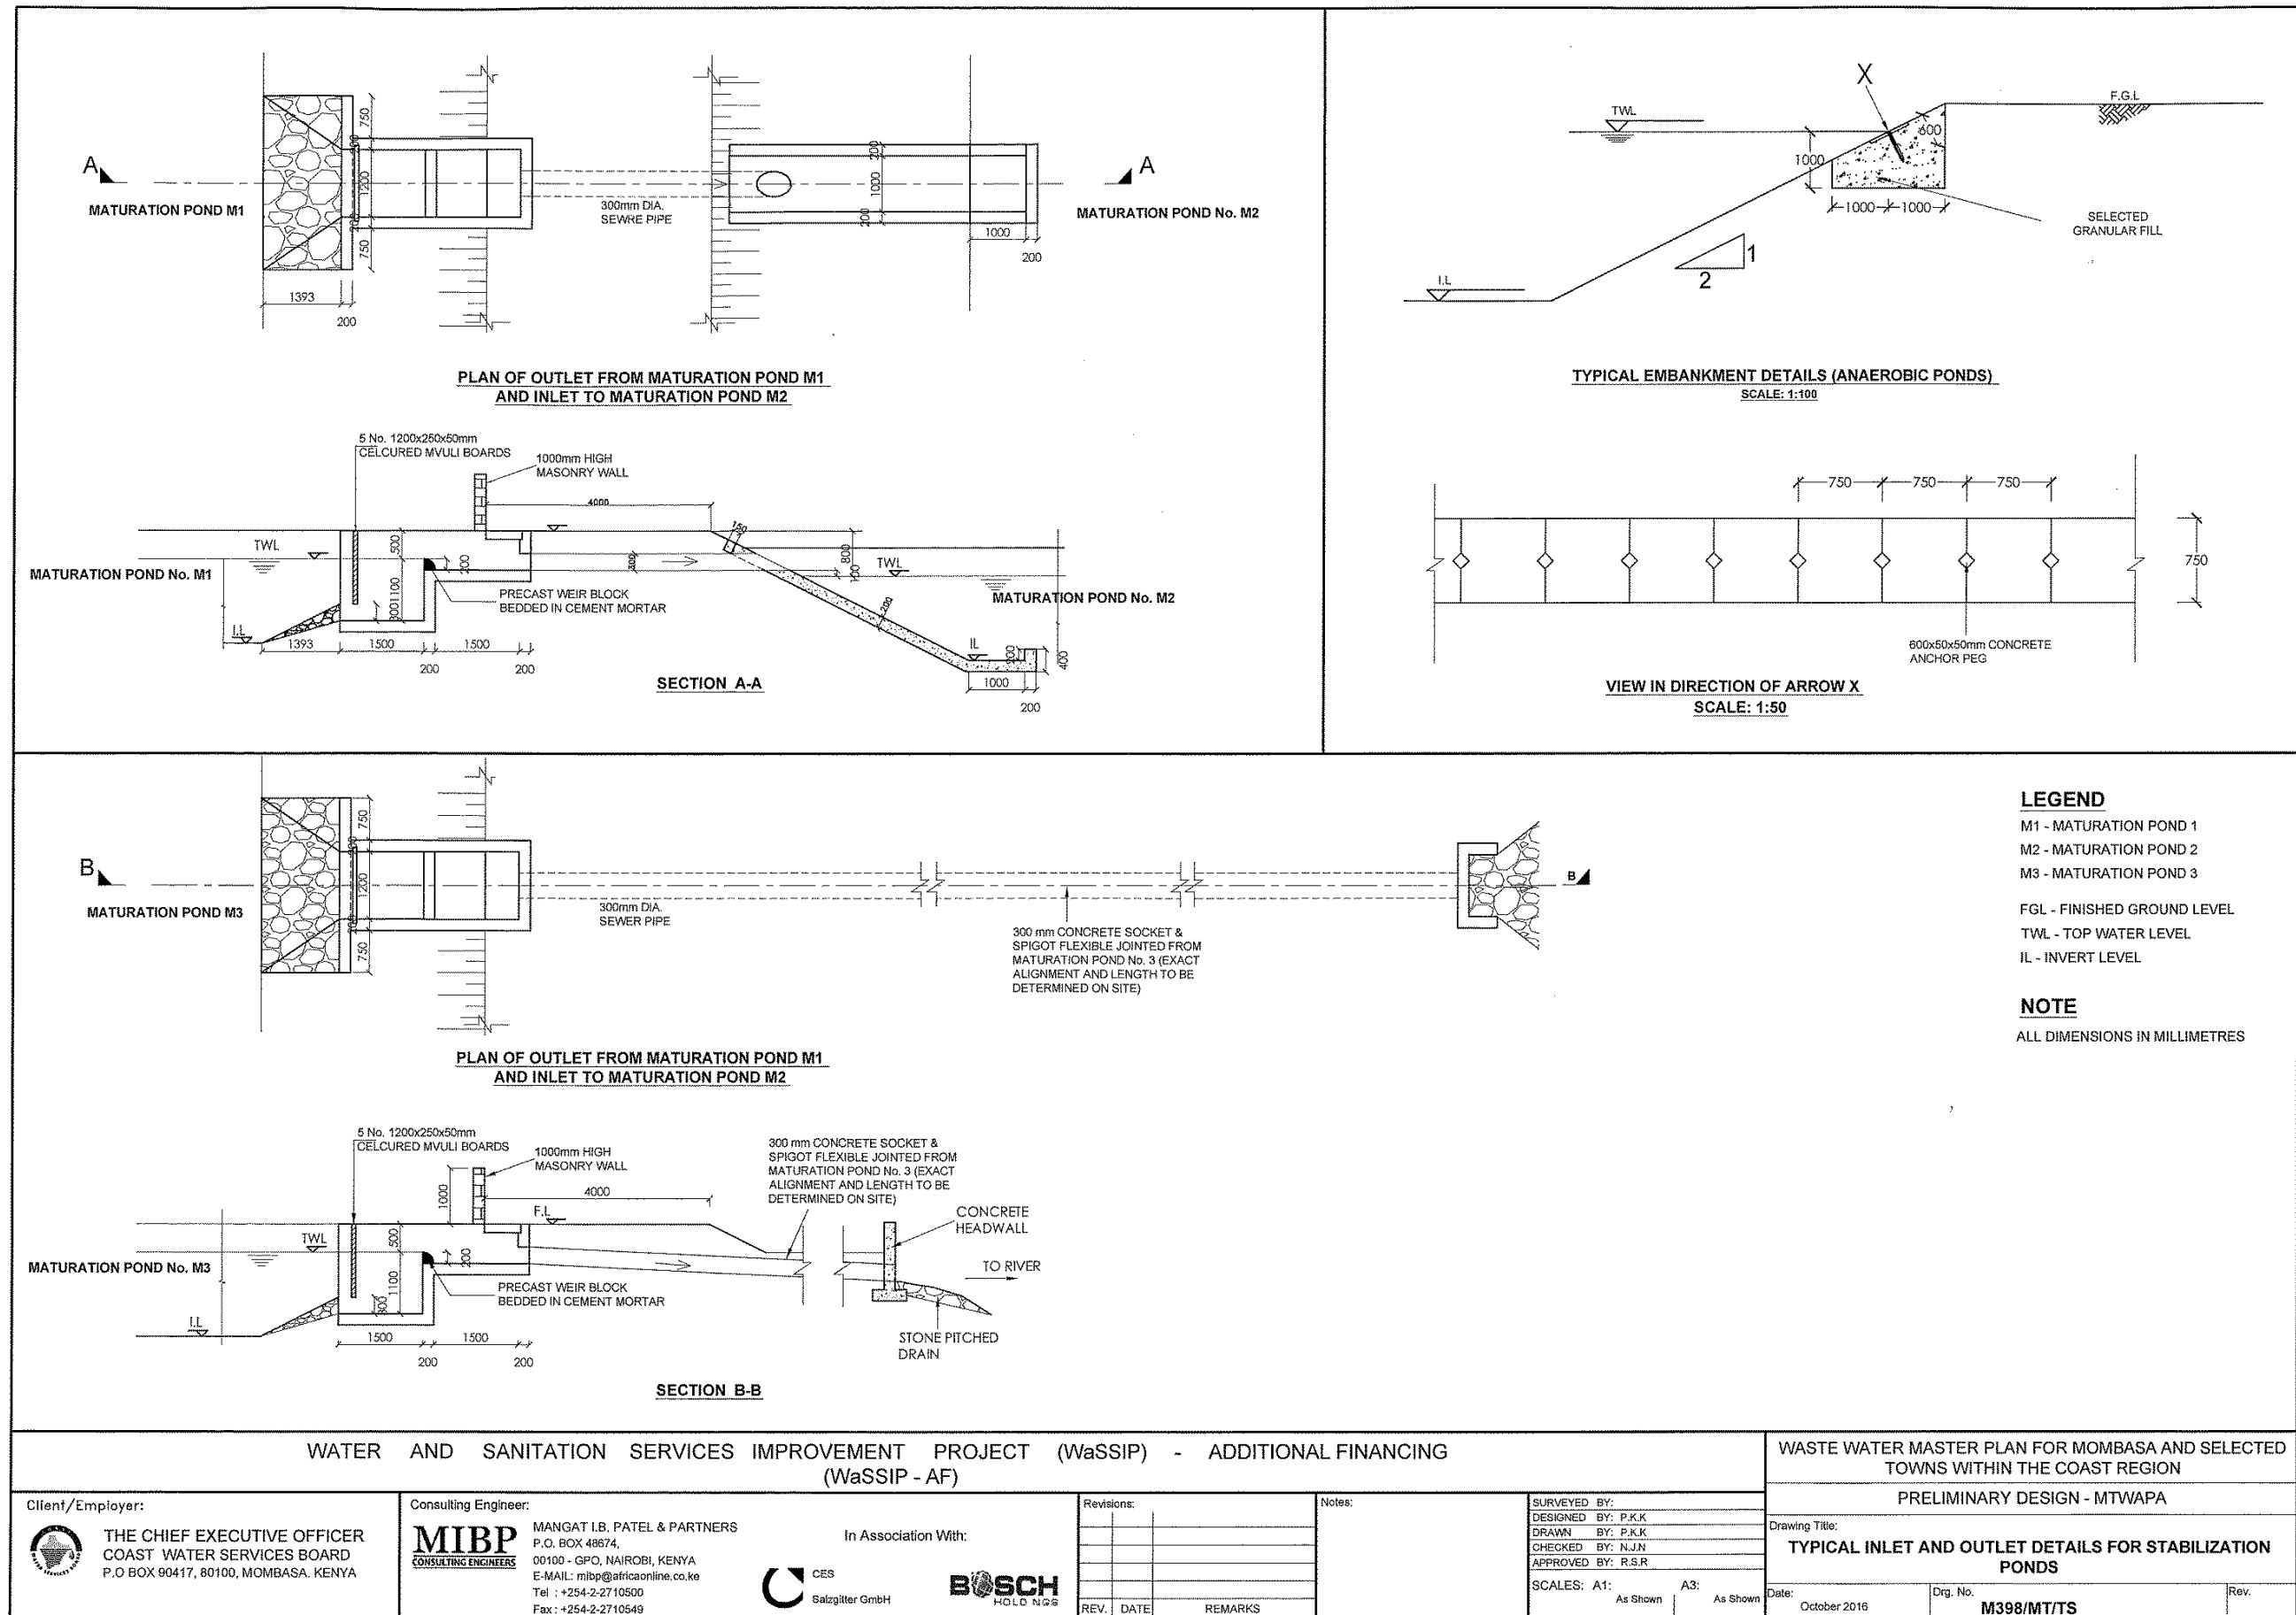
Typical Inlet and Outlet Structures for the Ponds
